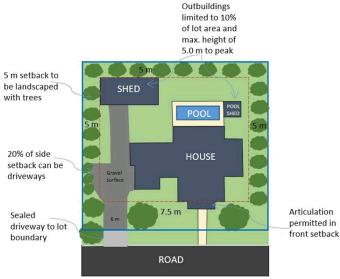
INDICATIVE SITE PLAN AND CONTROLS FOR LARGE LOT RESIDENTIAL (3000M² + ALLOTMENT)
